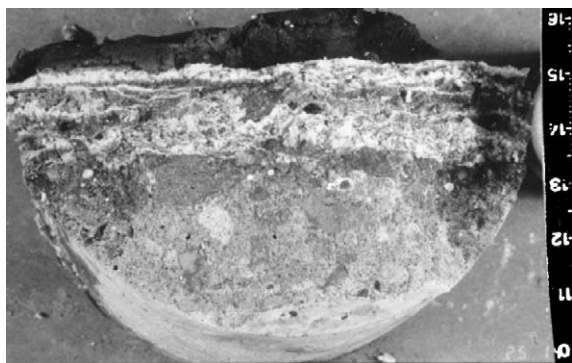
Thaumassite damaged concrete core (scale bar is divided into centimeters and millimeters).
